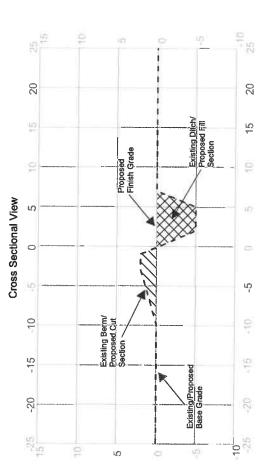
DITCH BLOCK (TYPICAL SECTION)
